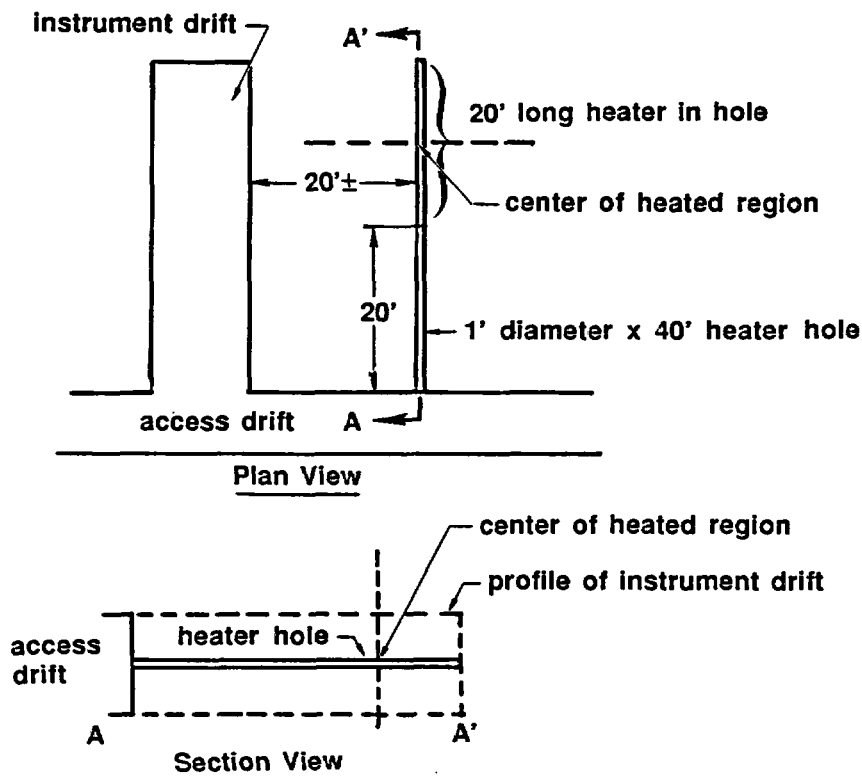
Schematic waste package environment test geometry to represent horizontal emplacement.
